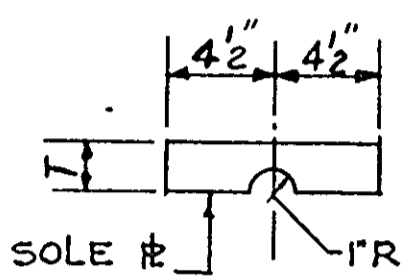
DETAIL OF MASONRY PLATES FOR FIX. SHOES FI AT PIER 1 STRINGERS (A) AND (S)
